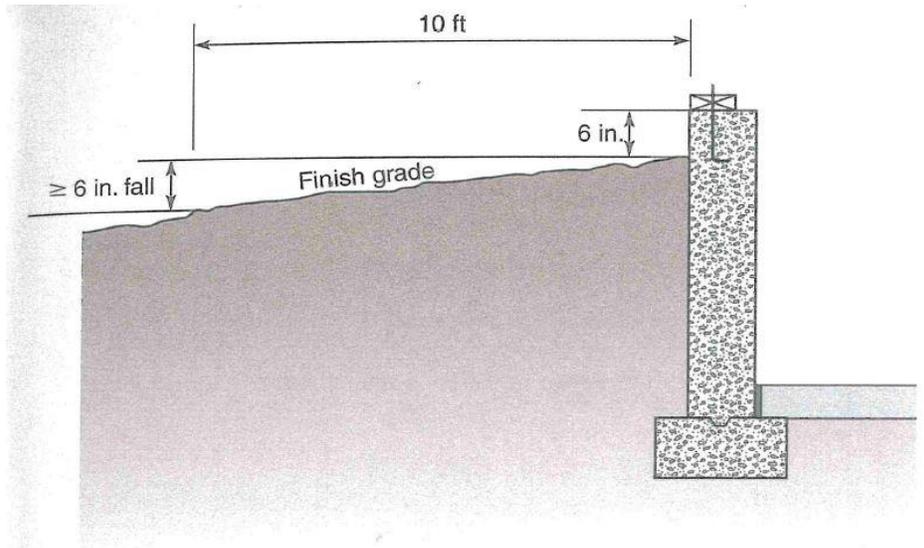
Grade sloped 6 inches in 10 feet to provide surface drainage away from foundation
